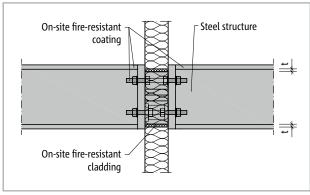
Fire protection Schöck Isokorb® T type S: On-site fire protection cladding T type S, fire protection coated steel structure; section
